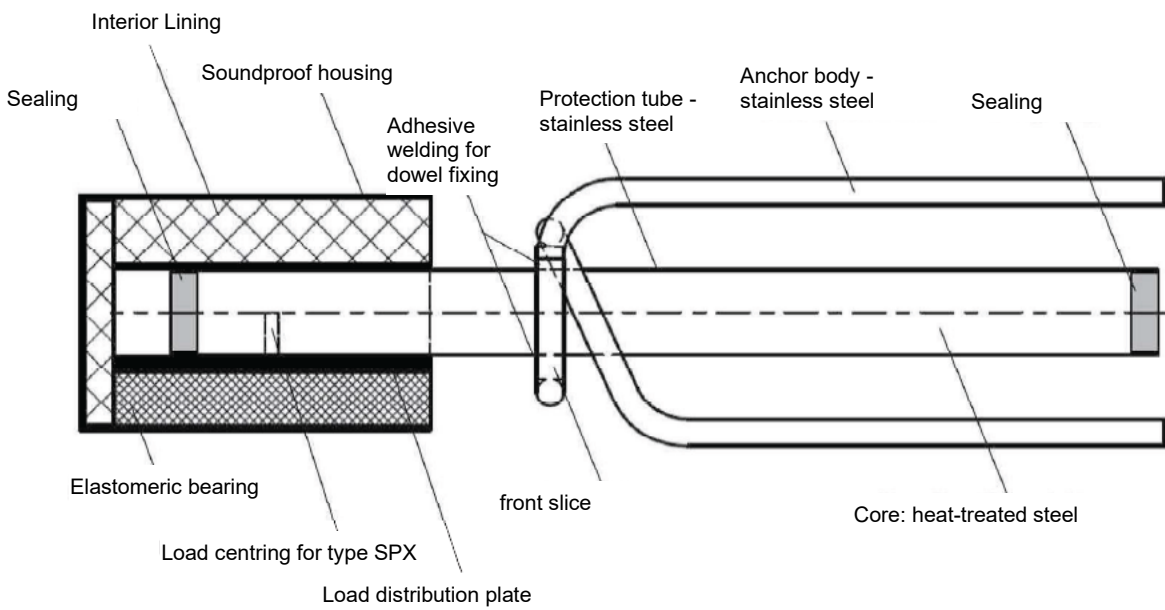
Structure - Egcopal version O (in-situ concrete)
